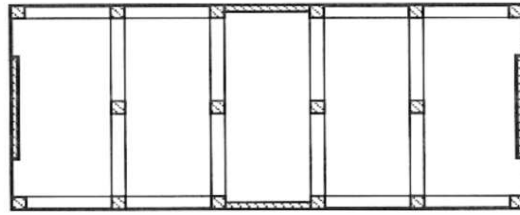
Plan view of a dual wall-frame structure [Priestley et al., 2007].
